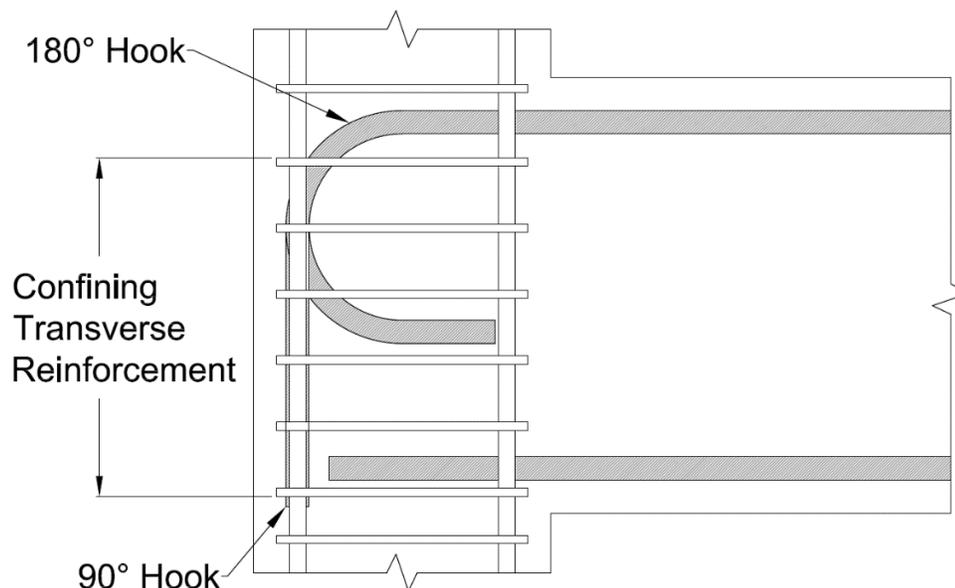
Transverse reinforcement providing confinement for 90° and 180° hooks
